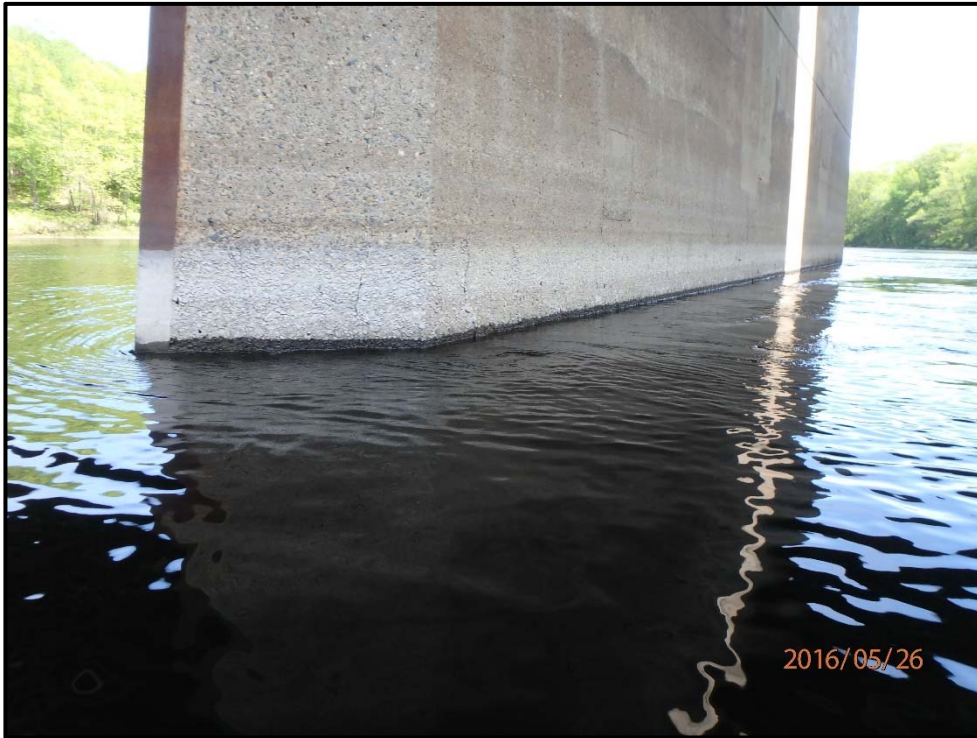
Typical Abrasion Band (Pier 3 Shown, North/West Face)
